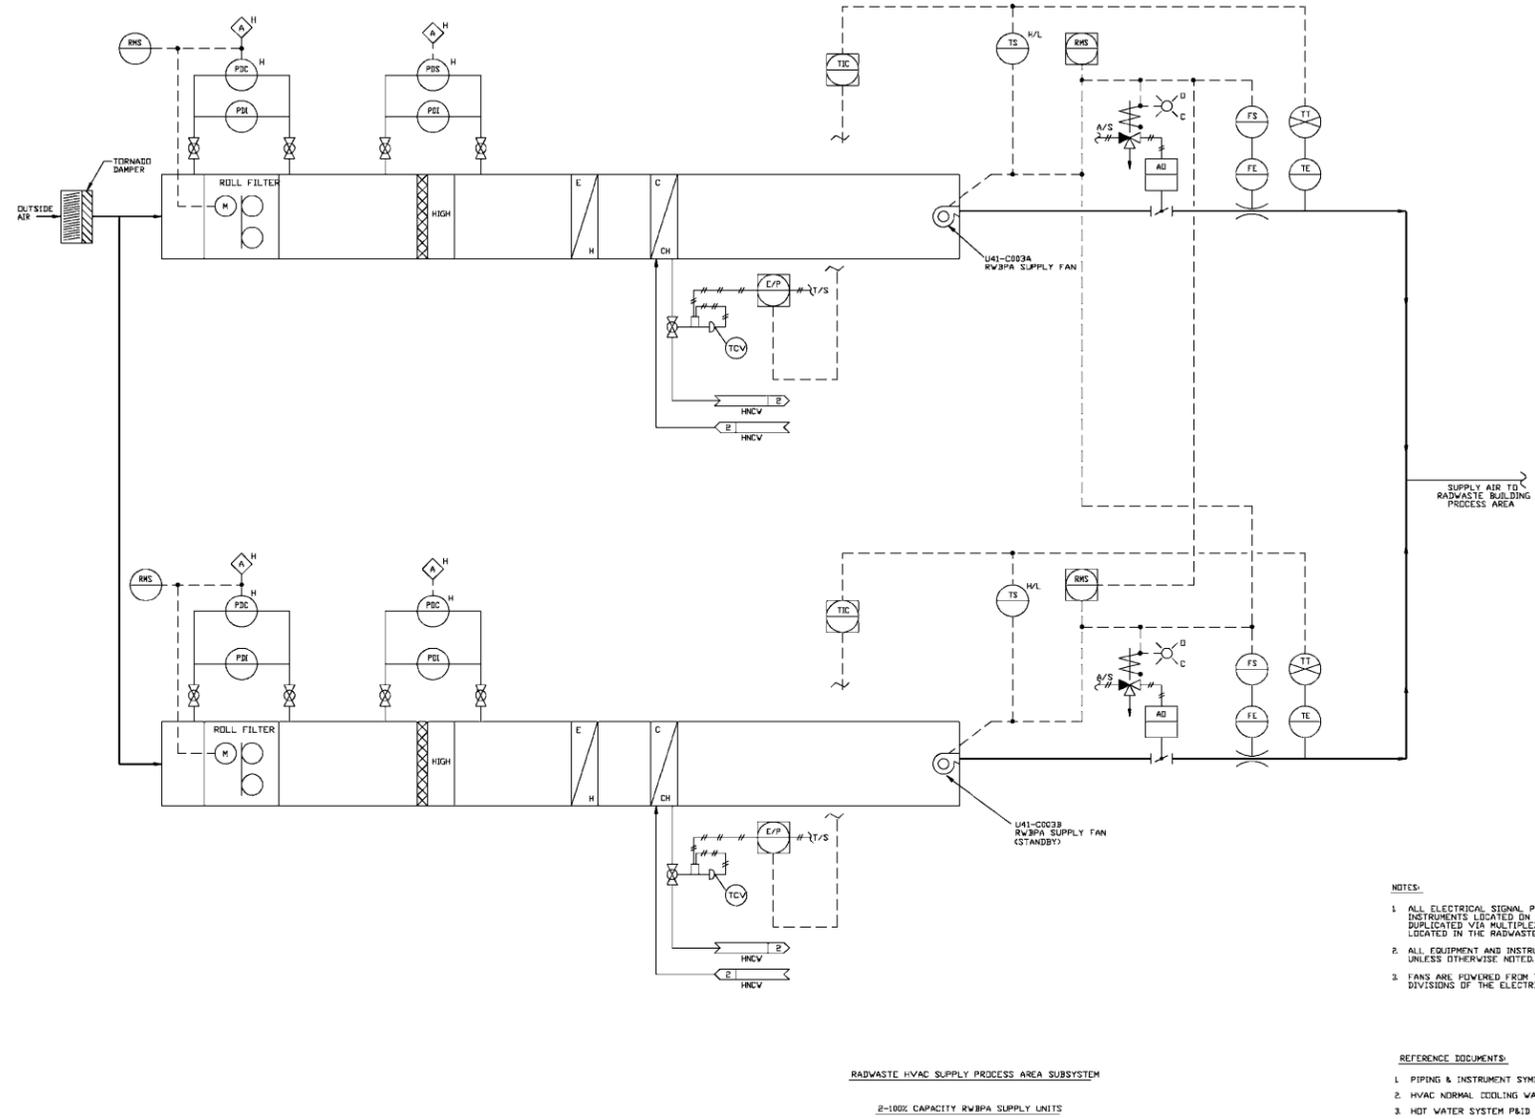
Radwaste Building HVAC (Sheet 2 of 3)
